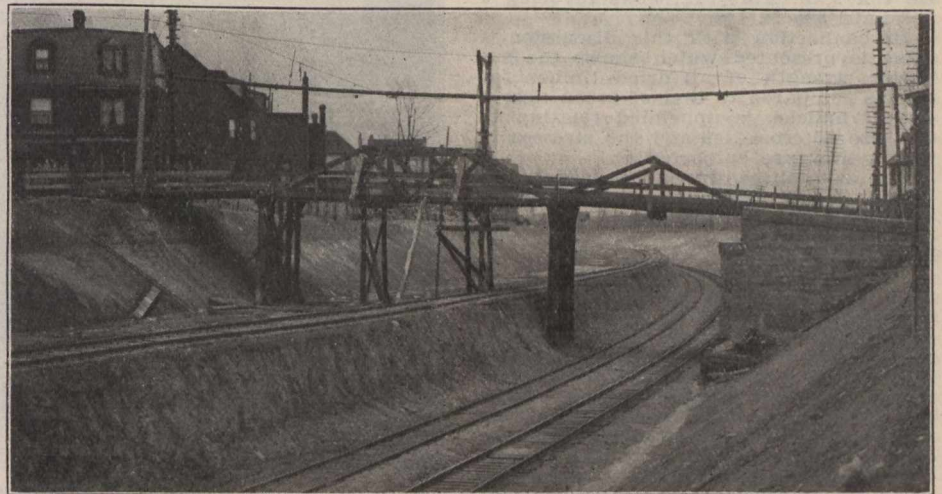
G.T.R. Grade Separation. Dunn Avenue Bridge, Dec. 1, 1911.
